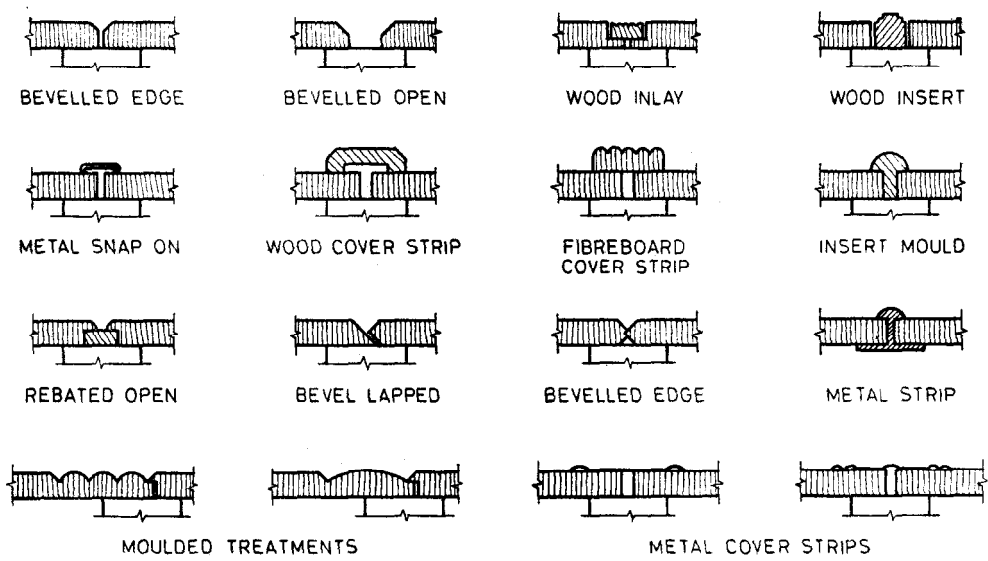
DETAILS OF FIBREBOARD JOINTS
